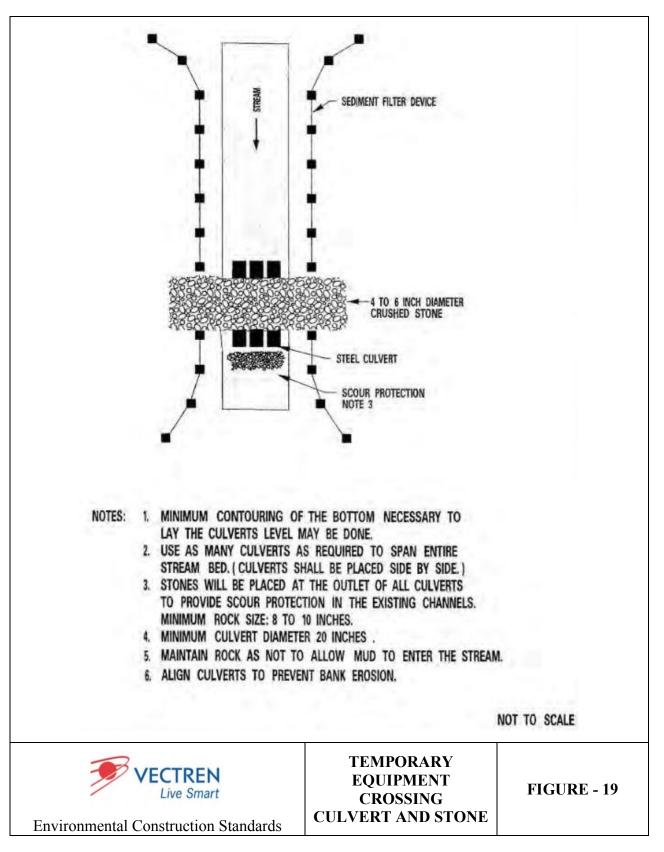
Temporary Equipment Crossing: Culvert and Stone
